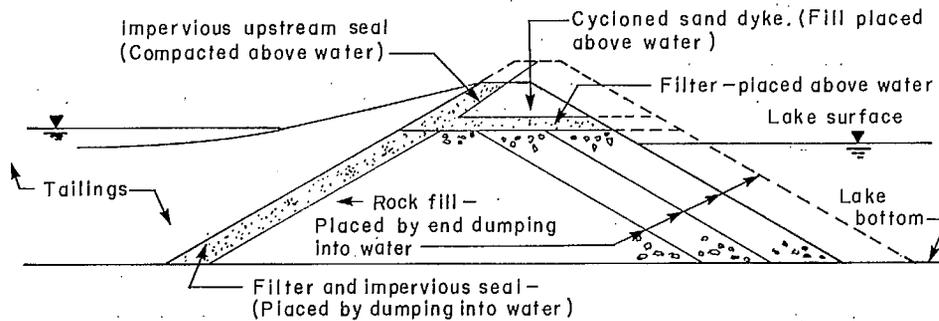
Tailings dams on pervious foundations showing control of seepage loss
